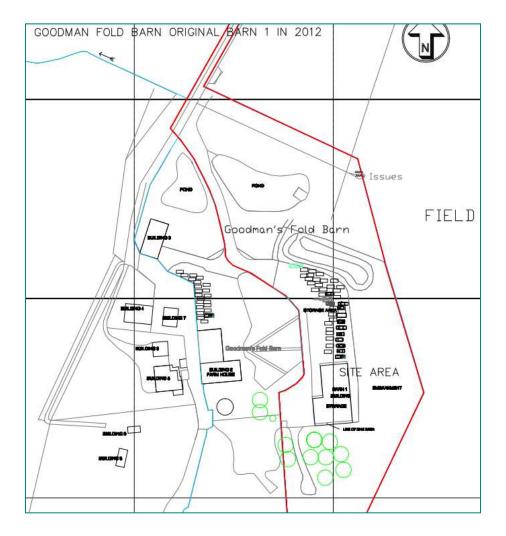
(Extract of the existing site plan showing previous buildings and external storage)
